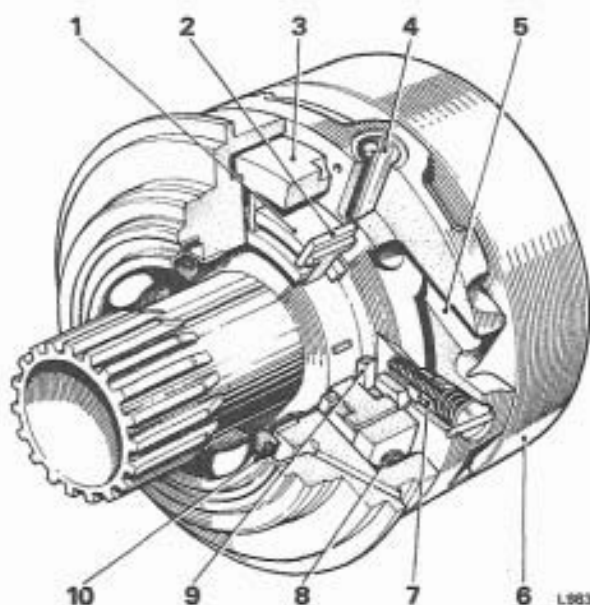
FRONT PUMP AND DRIVE-SHAFT
